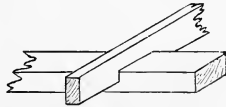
Joists notched out to Wall Plates, ends left on full depth.
